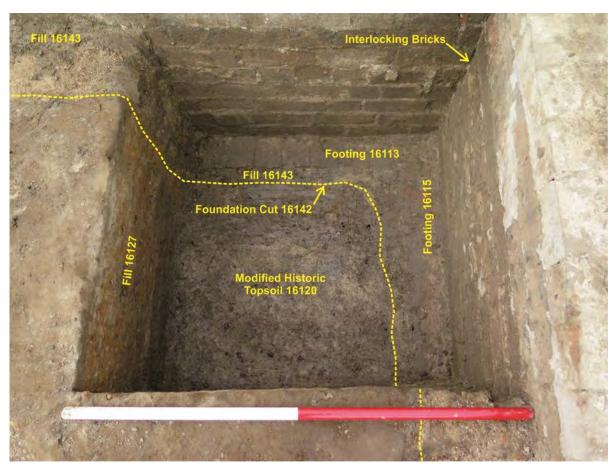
Foundation cut (16142/16126) exposed within TT1. The foundation trench cuts bulk clay fill 16127 and modified historic topsoil 16120. Brick sub-floor walls 16113 and 16115 are interlocking. View to the south. Scale 1m. IMG_3060.
